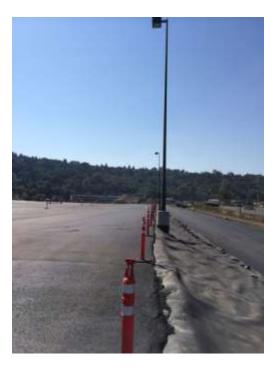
Asphaltic concrete pavement cover cap and low-permeability liner on north slope above north access road
